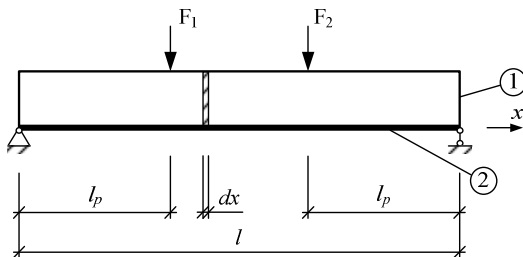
Loading scheme of strengthened reinforced concrete beam
